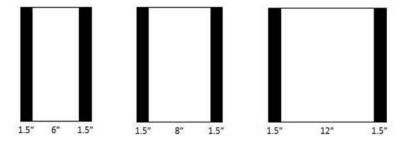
CPM-2 Contrast Pavement Marking, One-Pass Application
